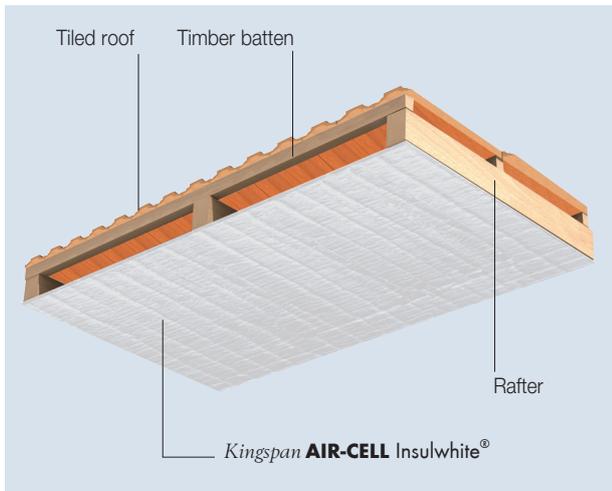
Kingspan AIR-CELL Insulwhite®* in a pitched tiled roof retrofit installation (attic conversion)
